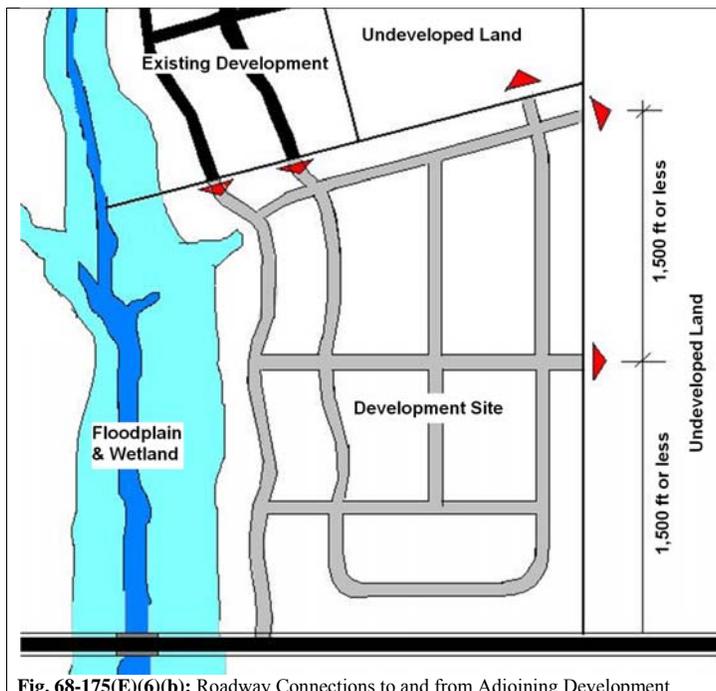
(E)(6)(b): Roadway Connections to and from Adjoining Development.
